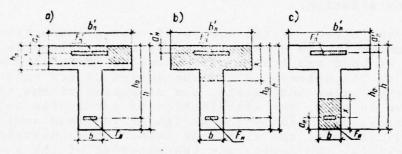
Scheme of the disposition of the compressed zone of the concrete in a prestressed slab of T-cross section (when calculating for stability): a-neutral axis passes through the beam flange (compressed zone--part of the beam flange); b-neutral axis passes through the rib (compressed zone--flange of the beam and part of the rib); c-neutral axis passes through the rib (compressed zone--part of the rib).
